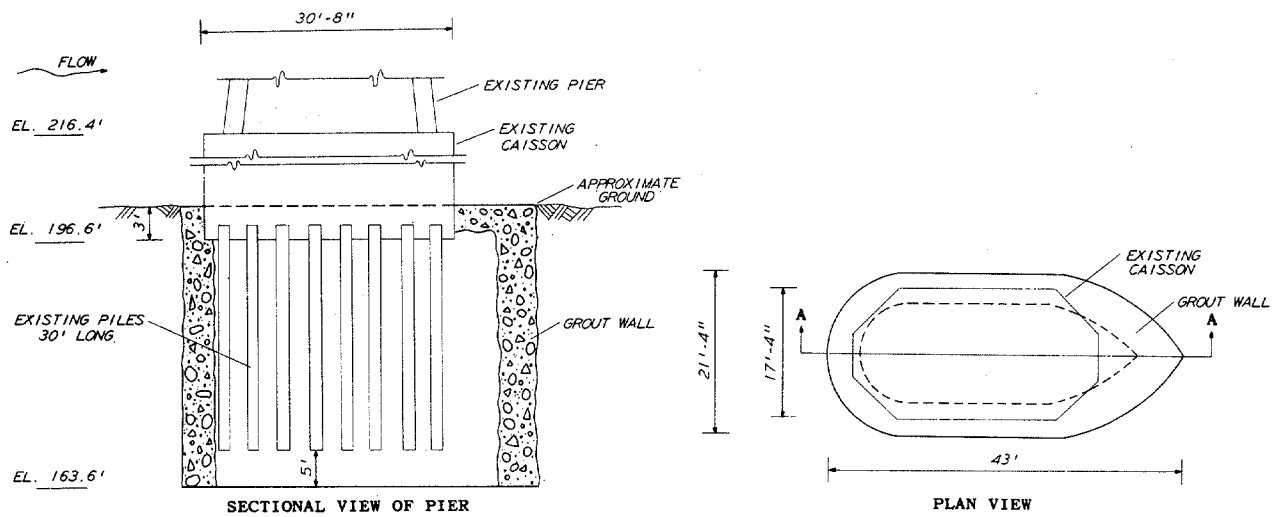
Detail of piers 7, 8, and 9 after extension in 1951.
